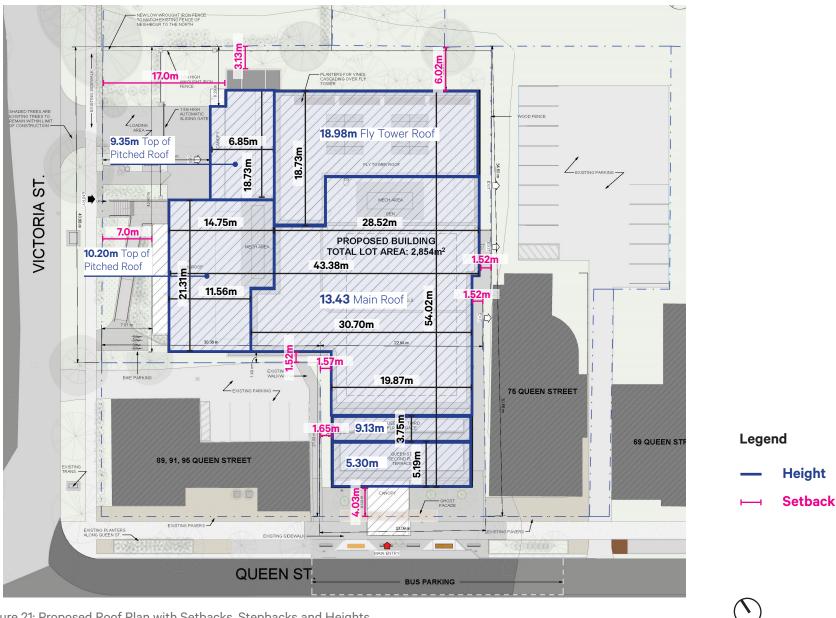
Proposed Roof Plan with Setbacks, Stepbacks and Heights
